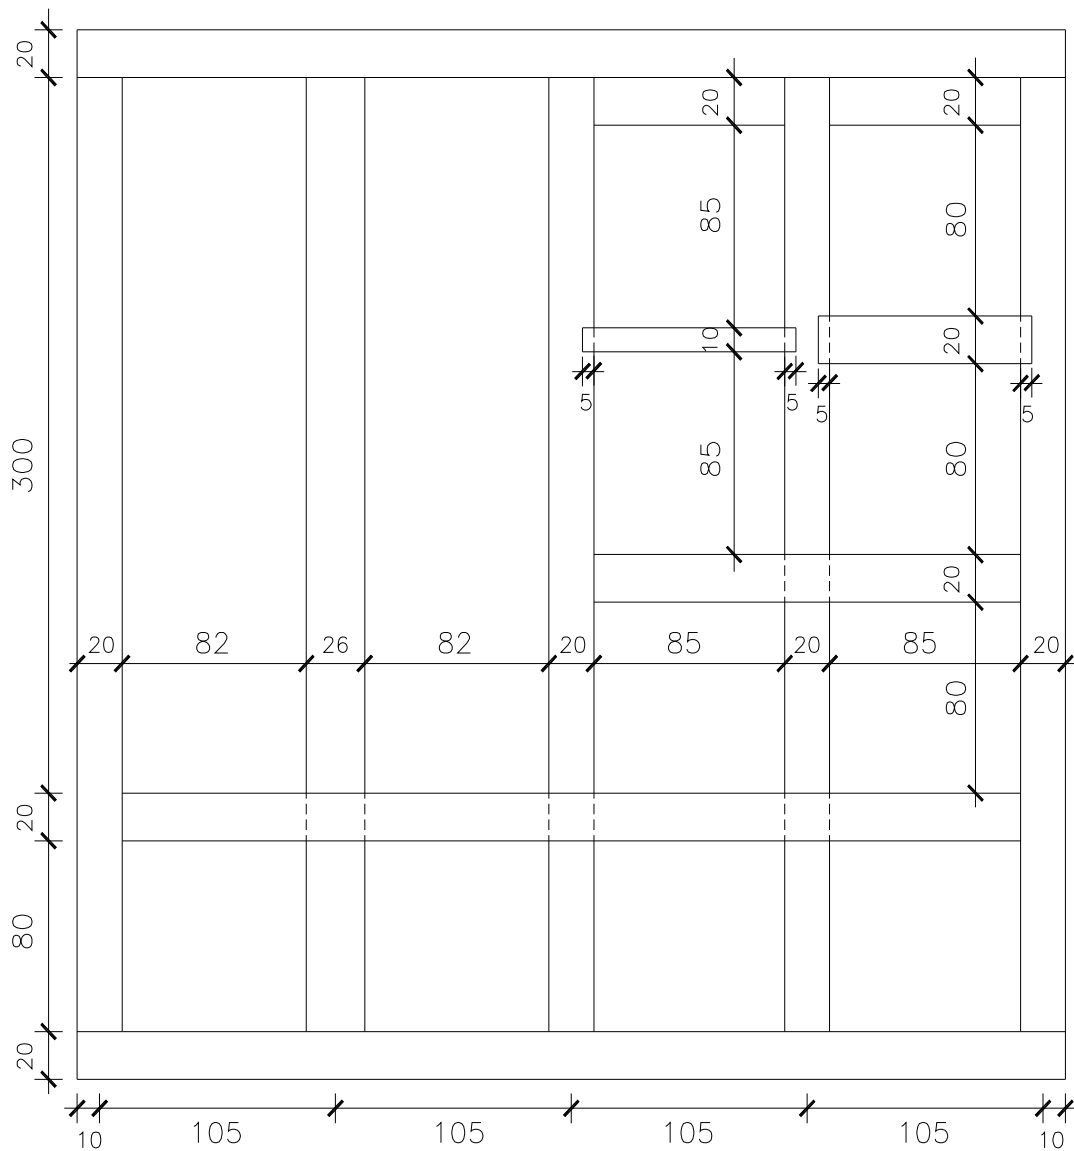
Outline of the wooden frame constructed for the casting of reinforced mortar specimens (dimensions in mm).
